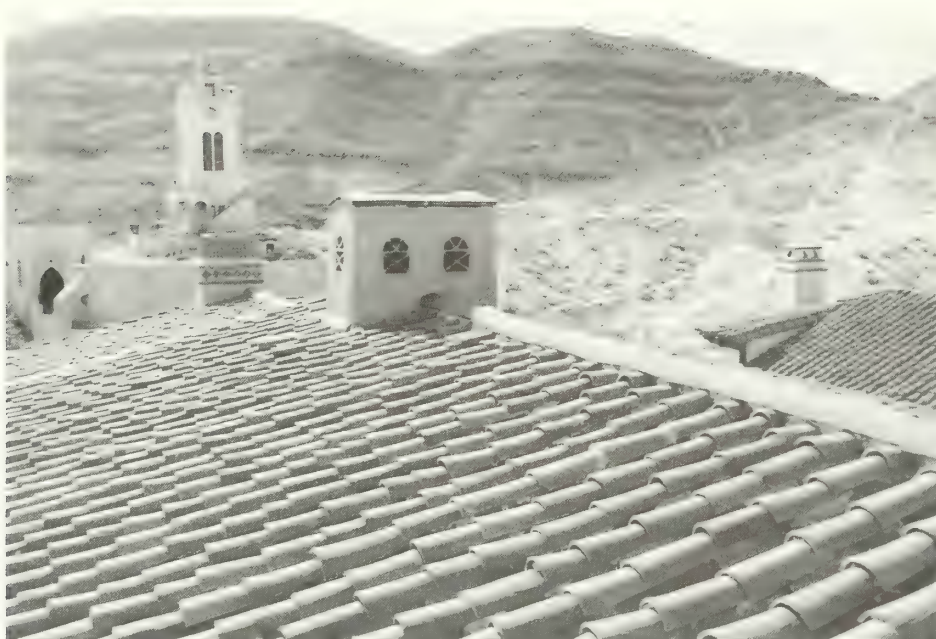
Main House roof, looking west from observation tower. This view shows the purposeful lack of horizontal course alignment. Again note tiles immediately below the ridge. Photo by R.L. Carper, April 1989.
